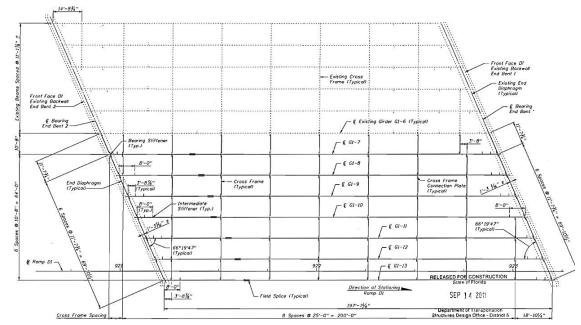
Framing plan of the SR-589 Bridge over Hillsborough Avenue
